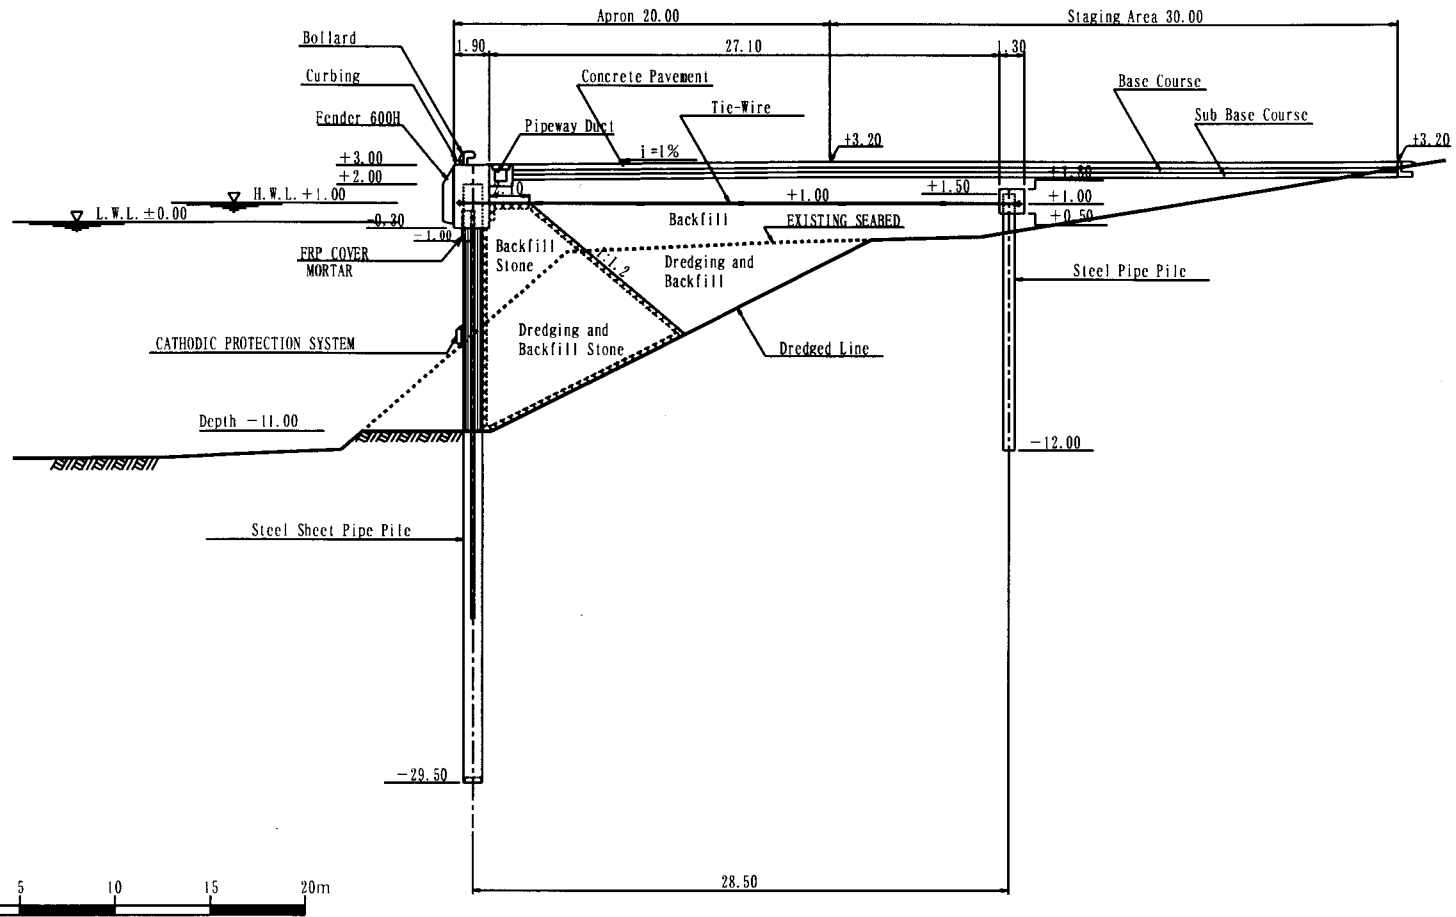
Steel Sheet Pipe Pile Bulk Head Type for New Wharf (Type A)
